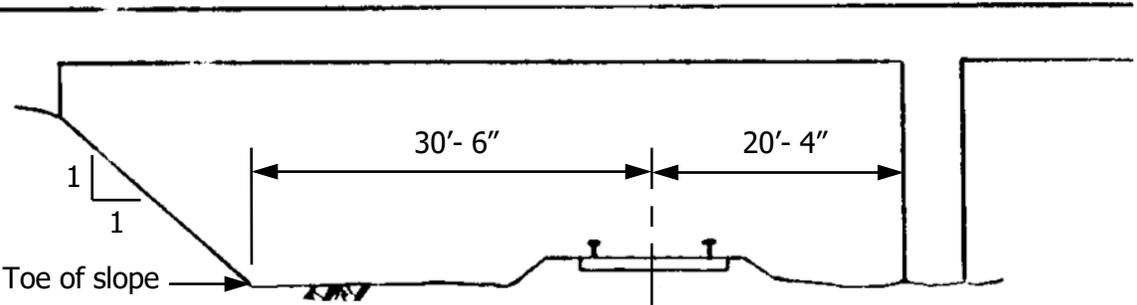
Bridge elevation view with one passenger rail and one freight rail track below the bridge.
